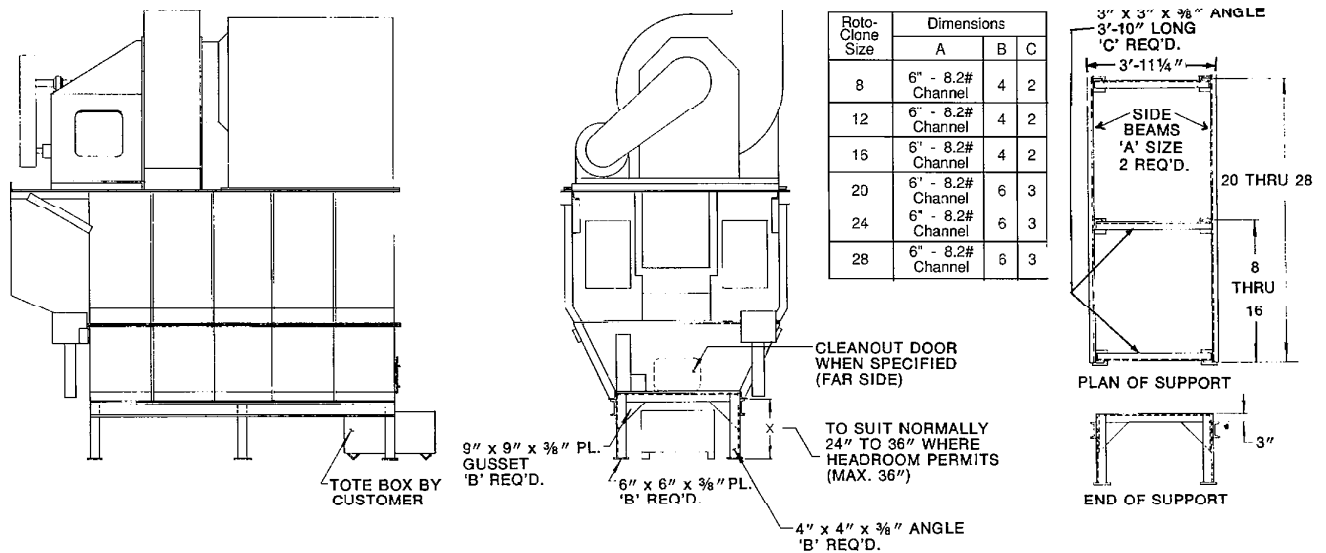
Typical support to elevate Type 'N' Model 'B' RotoClone, Arrangement B.
